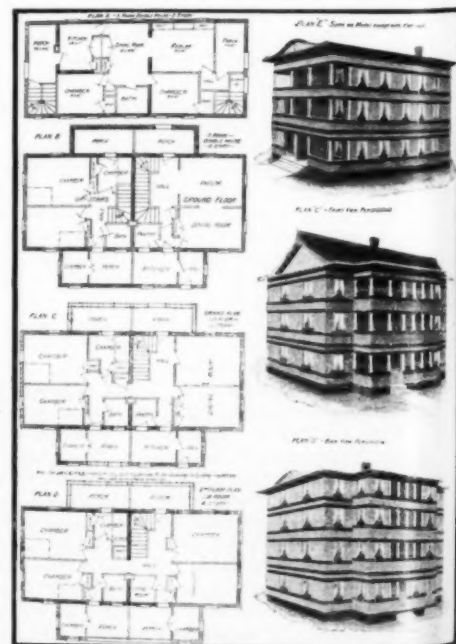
SAMPLE FLOOR PLANS AND HOUSE POSSIBLE WITH THE SAME SIZED CEILING AND BLOCK MOLDS, AND UNDER SAME SIZED ROOF.
